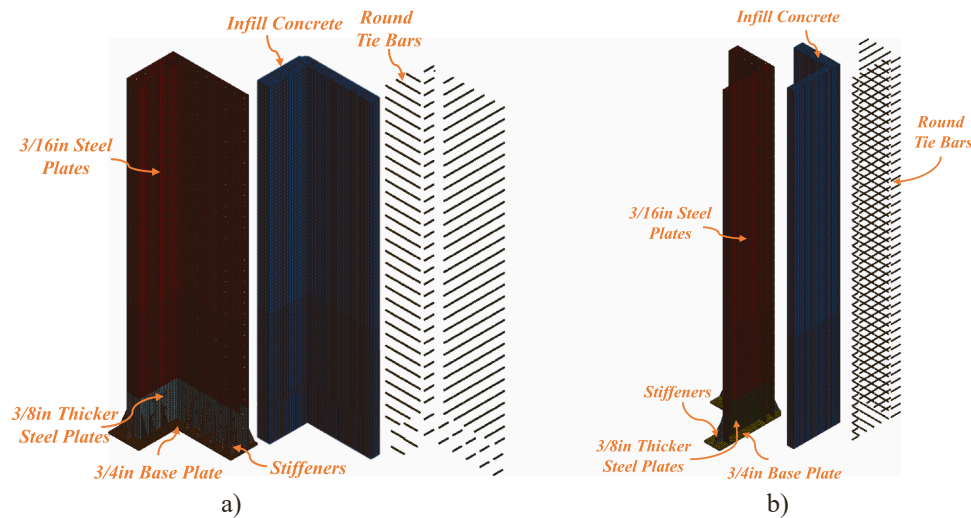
Finite element model of a) C-, and b) T-shaped wall specimens (1 in. = 25.4 mm).
